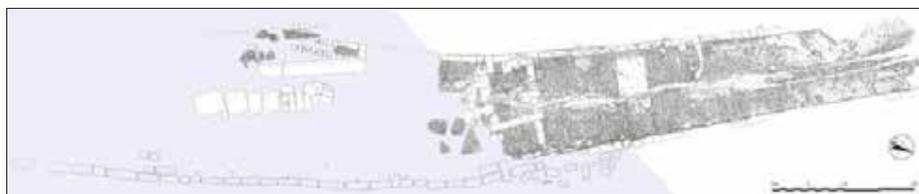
San Cataldo (Lecce, Italy): plan of the Roman pier ruins (by dr. Silvia Marchi).
